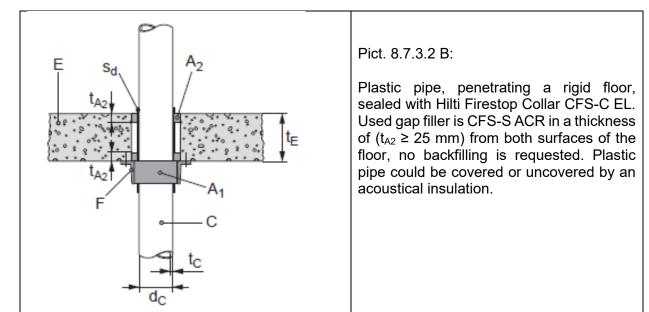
Gap seal with CFS-S ACR with/without backfilling around a plastic pipe, penetrating a floor
